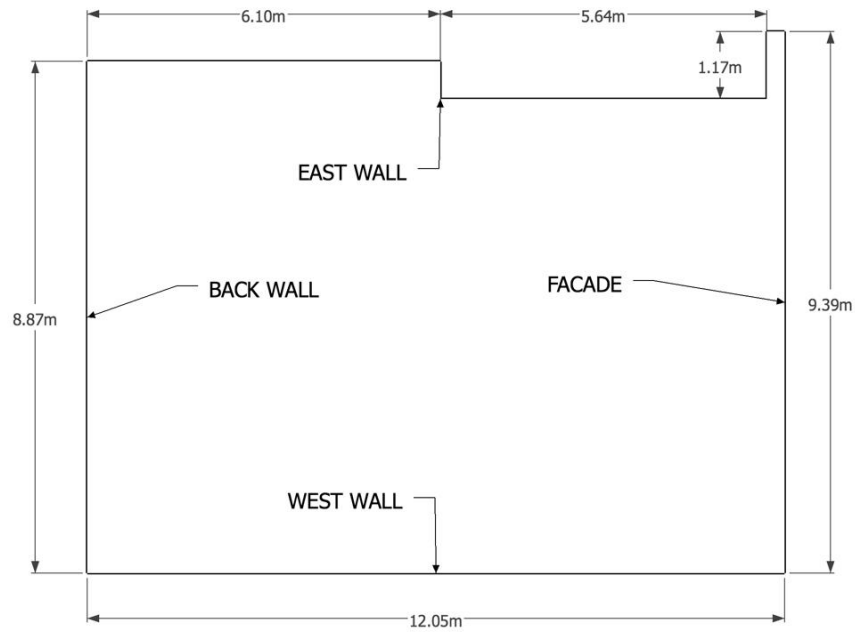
Floor Plan of the Atrium [Basarir 2009 (1)]
